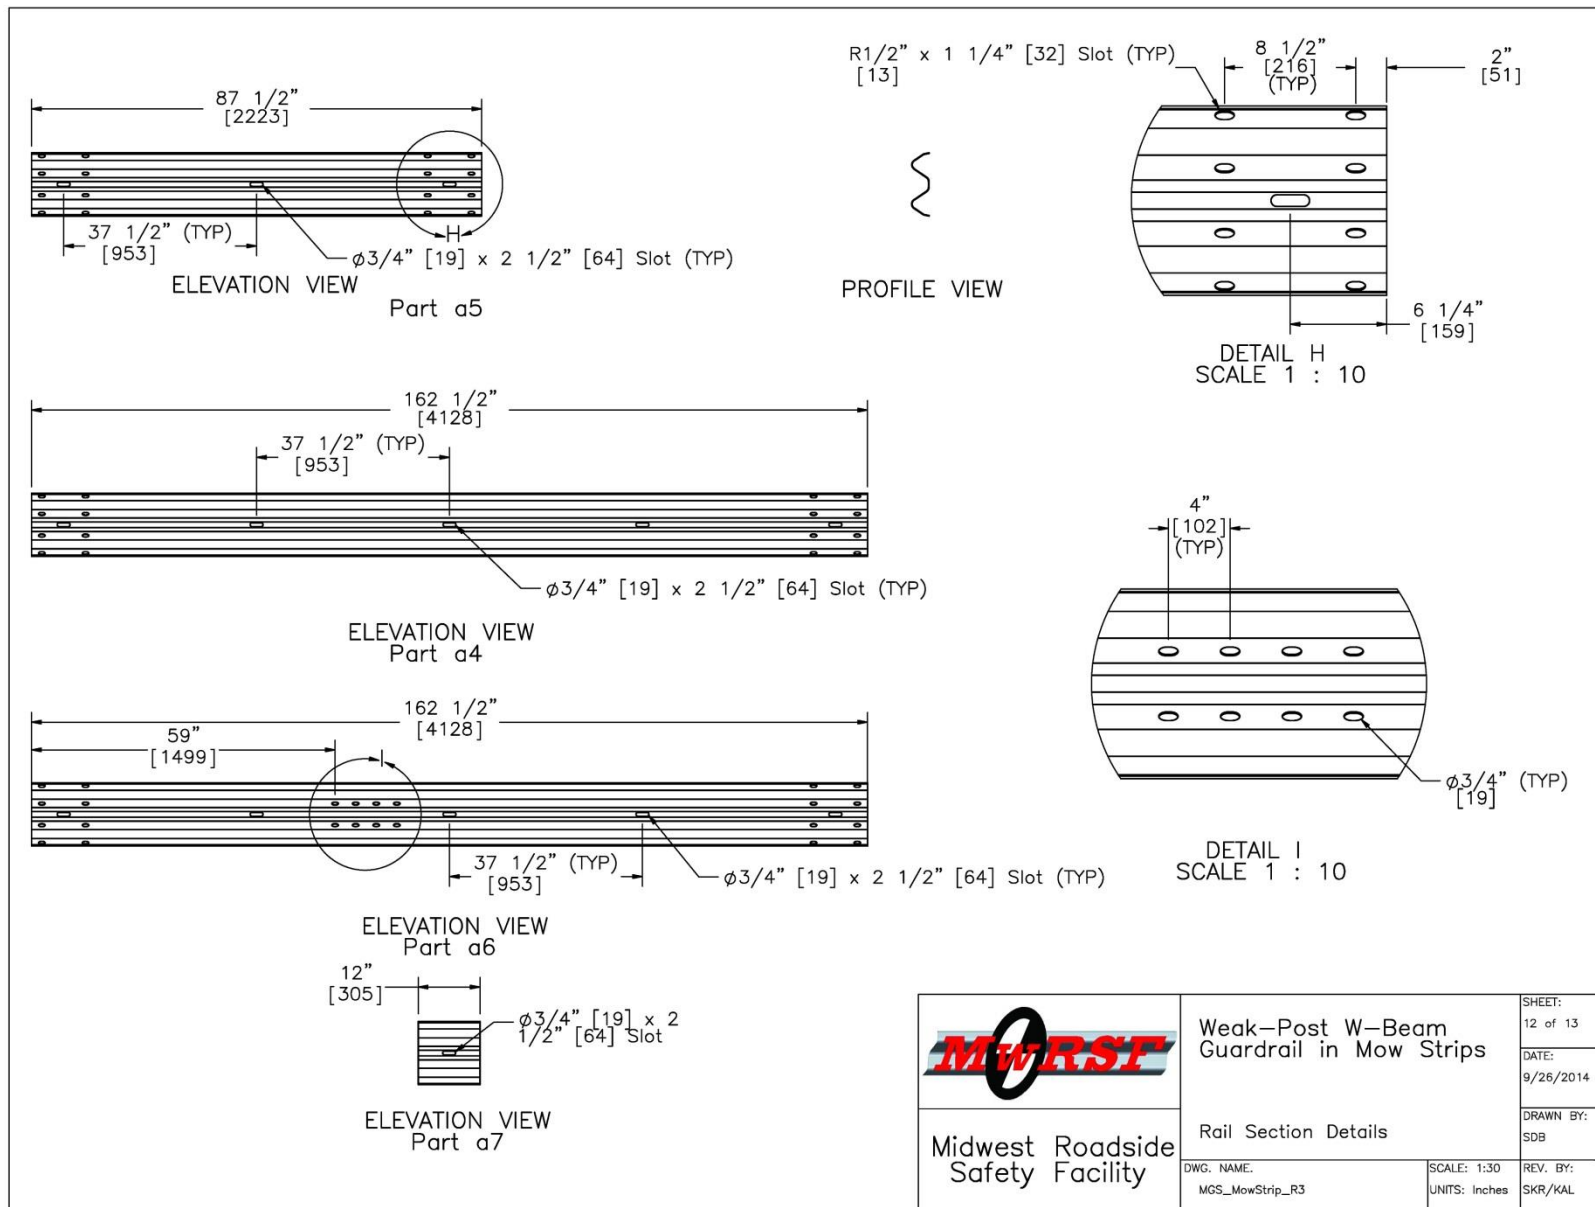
W-Beam Guardrail and Backup Plate Details, Test No. MGSMS-1
